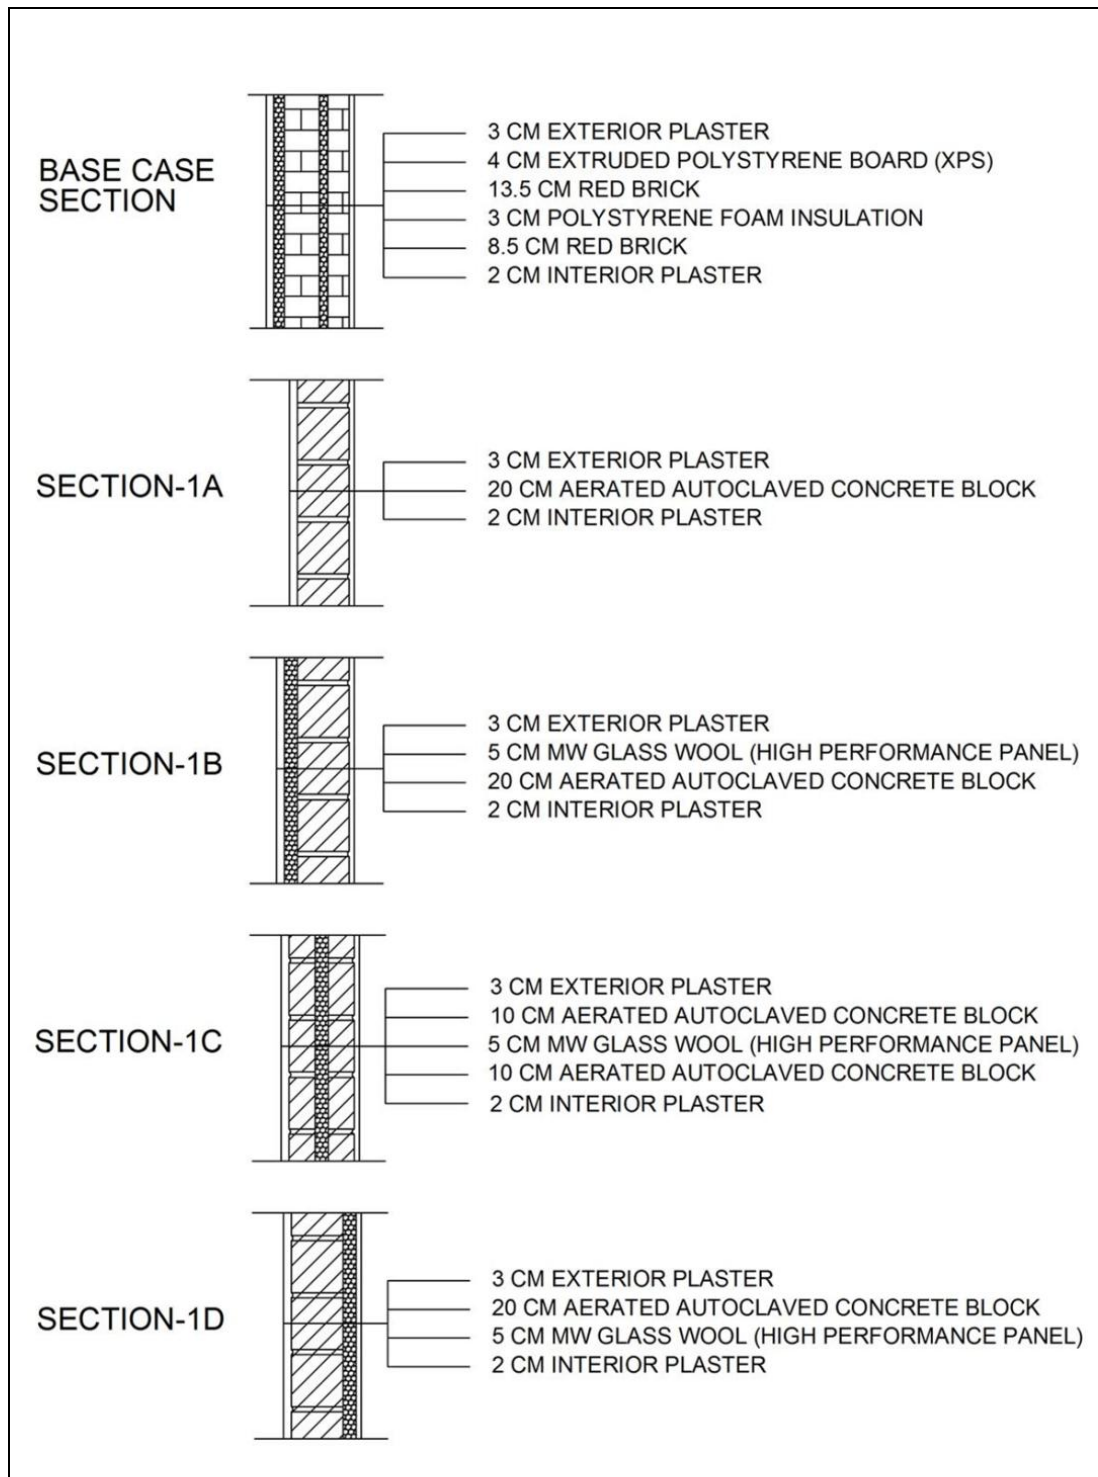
Aerated Autoclaved Concrete Blocks for four different Wall System Sections and The Base Case Section.
